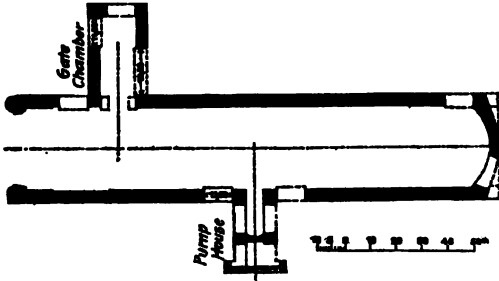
PLAN OF ONE DOCK-CHAMBER, SHOWING METHOD OF CONCRETING WITH SMALL CAISSON.
